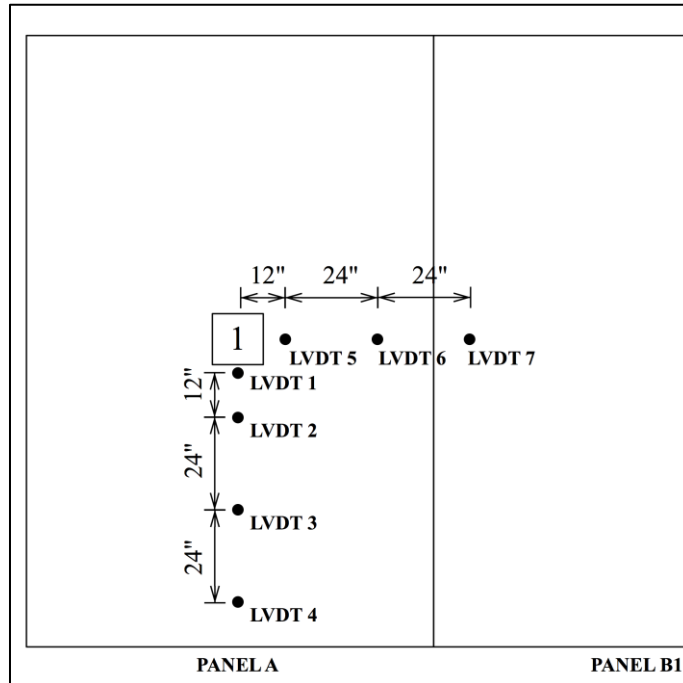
Instruments Layout at Test Location 1 for Test Pavement III
